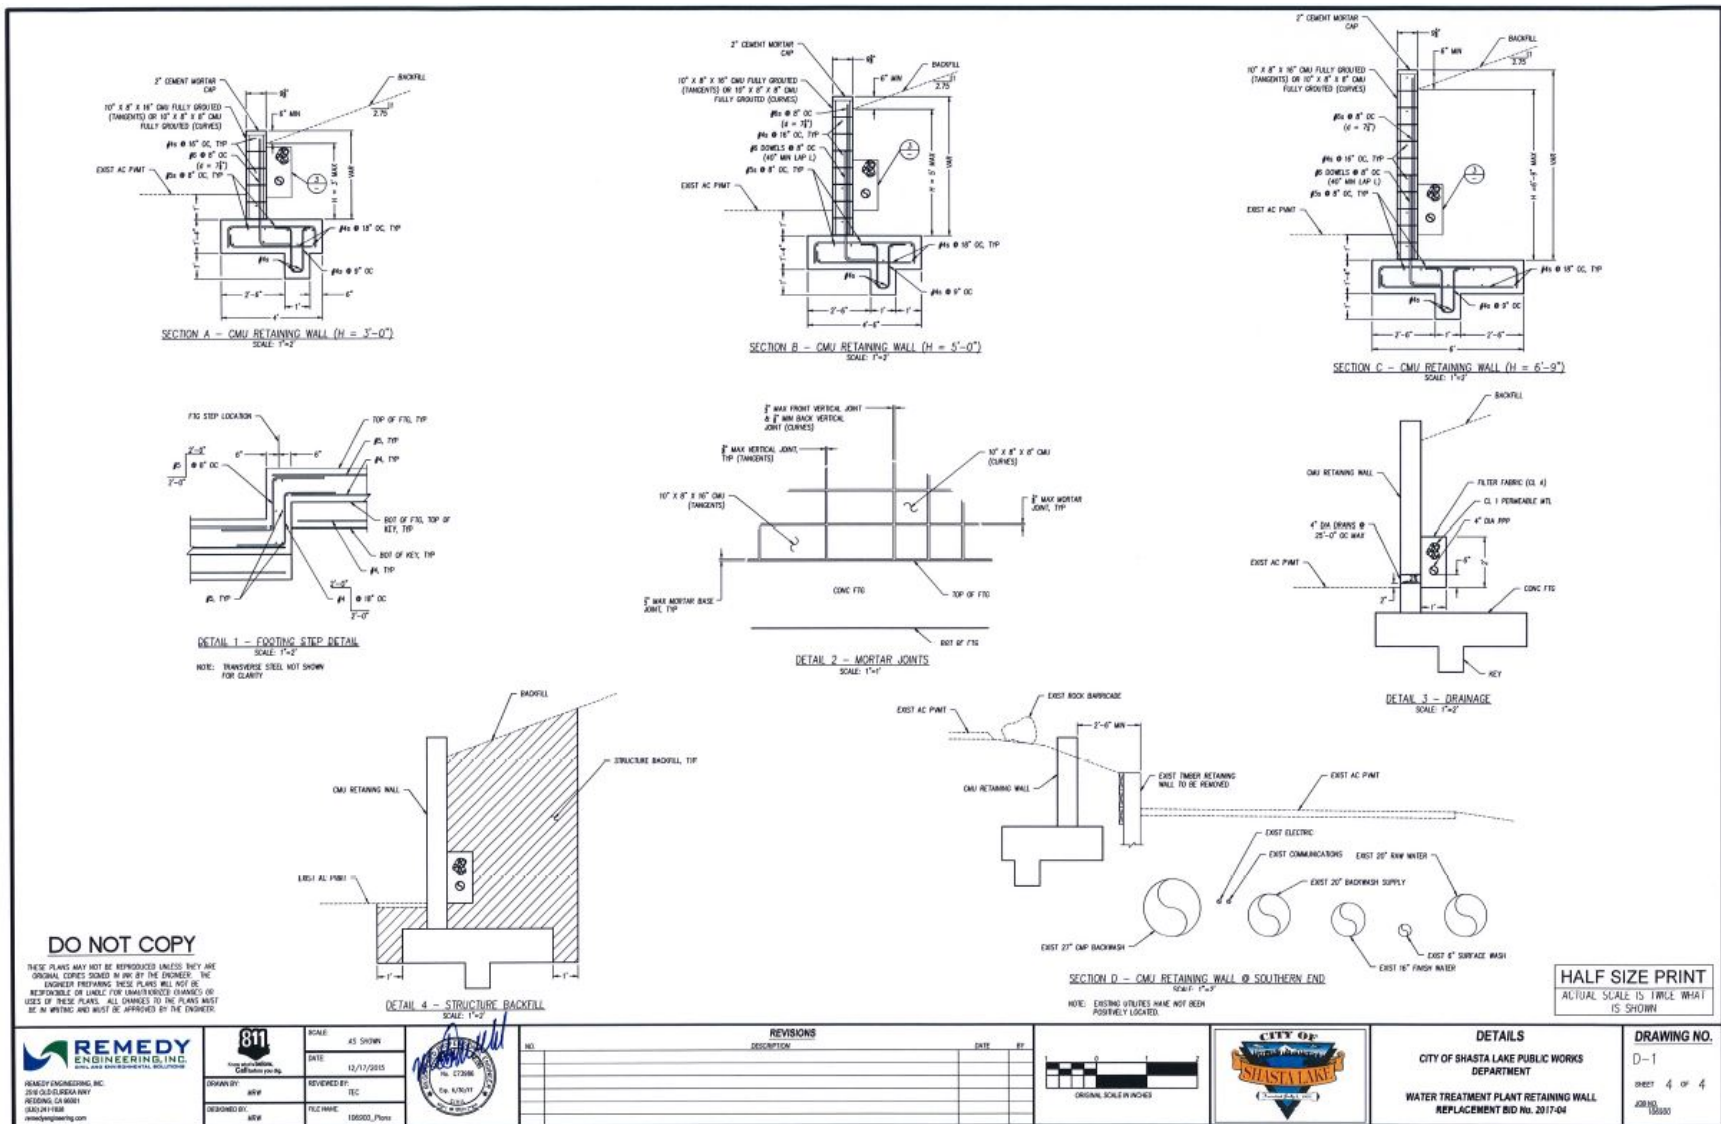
B. Plan details, courtesy City of Shasta Lake Public Works.
